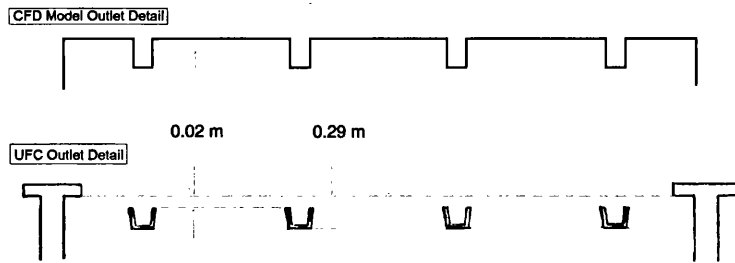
Top: Trough outlet detail on CFD model of UFC. Bottom: Engineering drawing of trough details of UFC.
